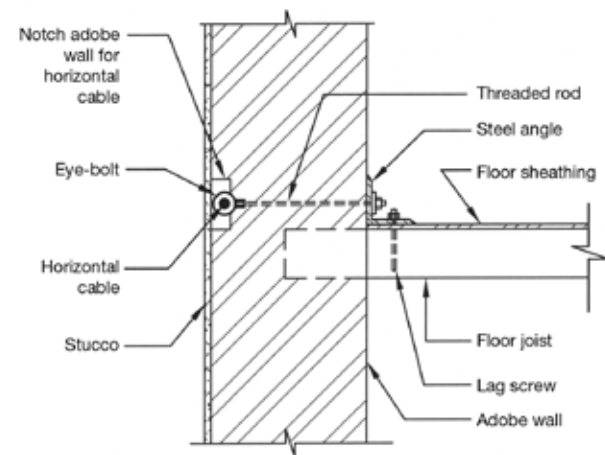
Connection between floor framing and a horizontal cabling system. This system will prevent failure due to the poor tensile capacity of the adobe material.
